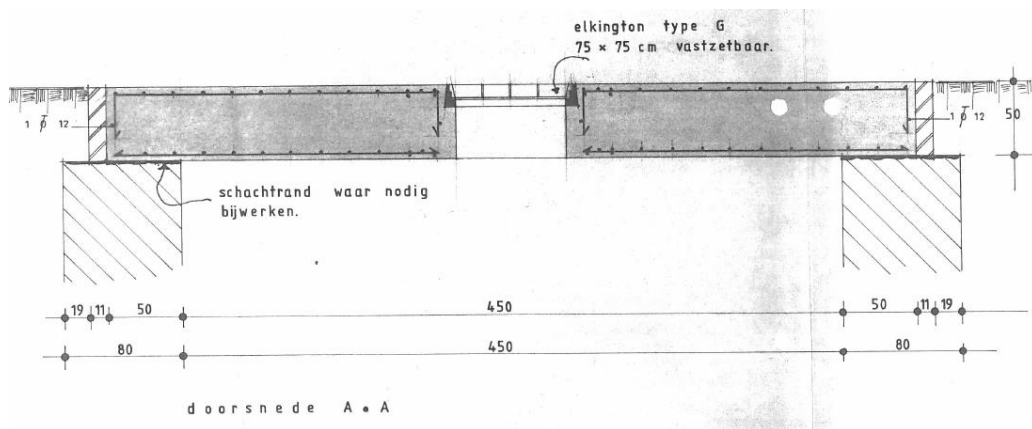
Sectional drawing shaft cover shaft III, ON I /35/
